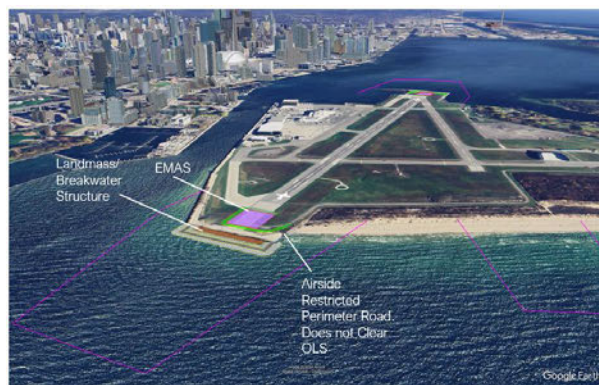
Alternative 3 EMAS Conceptual Site Plan
